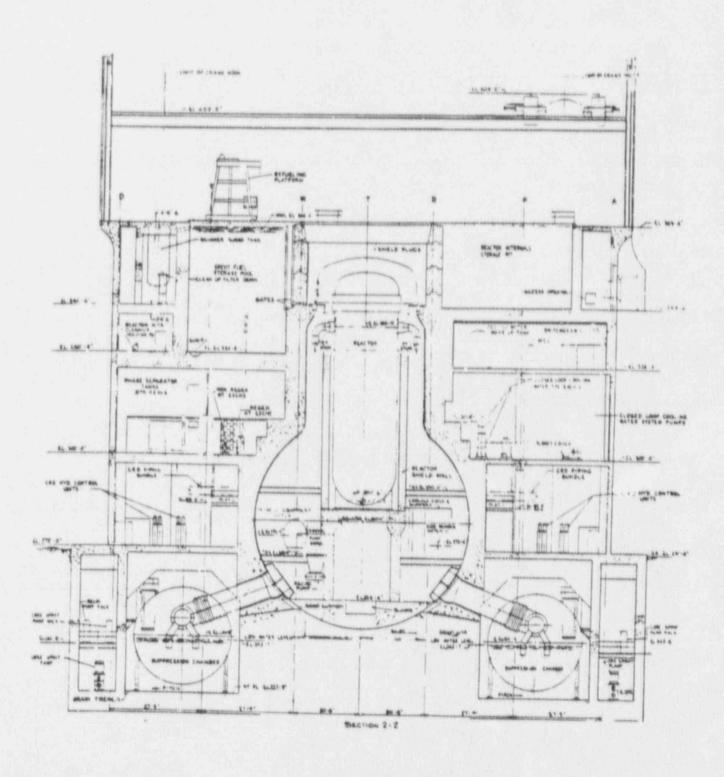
Fitzpatrick Reactor Building Elevation Views (page 2 of 5)
